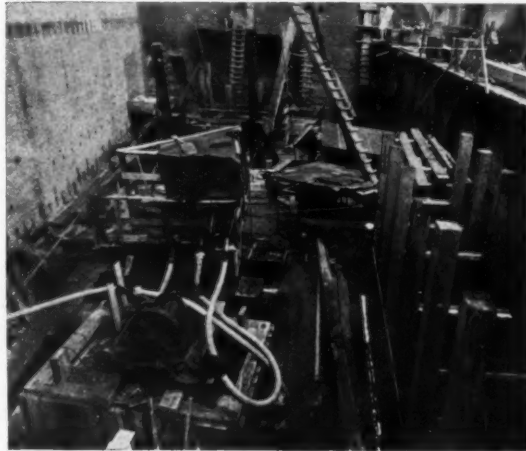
General view of operations on Section One of the new Standard Oil Building, at corner of New Street and Beaver Street
